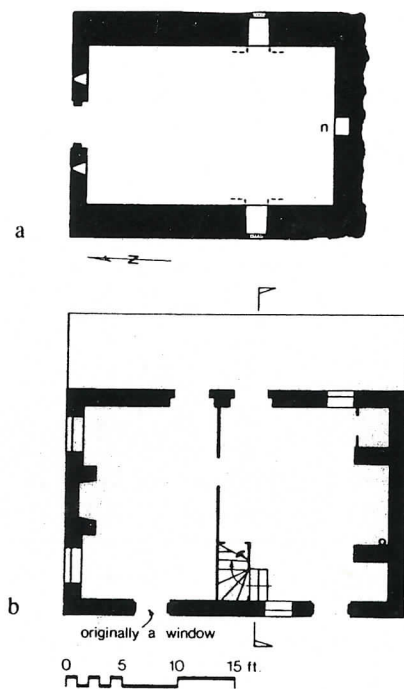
Cellar and first-floor plans of Fort Paul Long.
